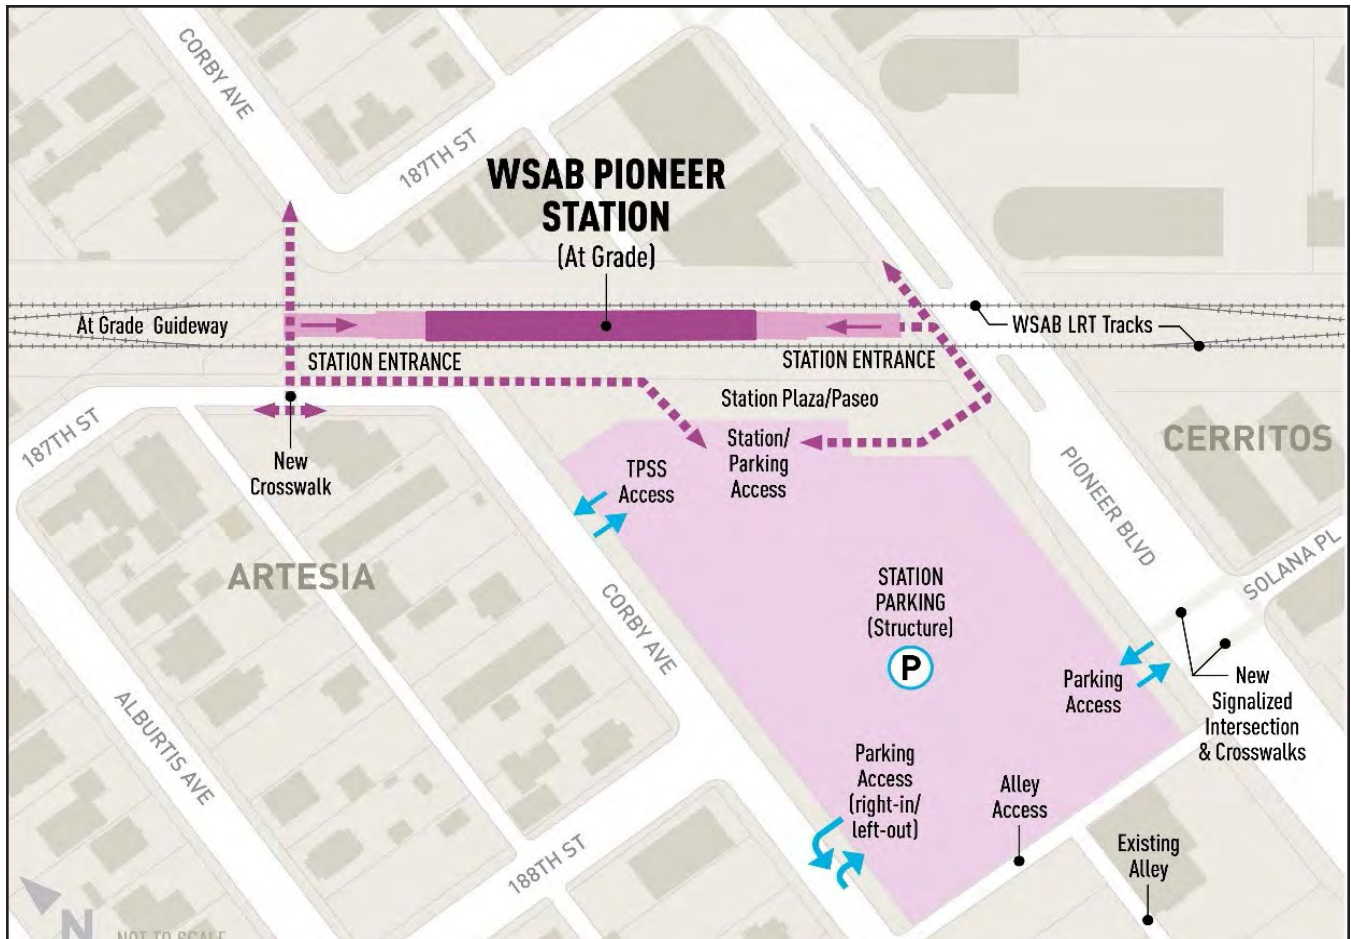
Pioneer Station Access; Source: Cityworks Design and WSP
